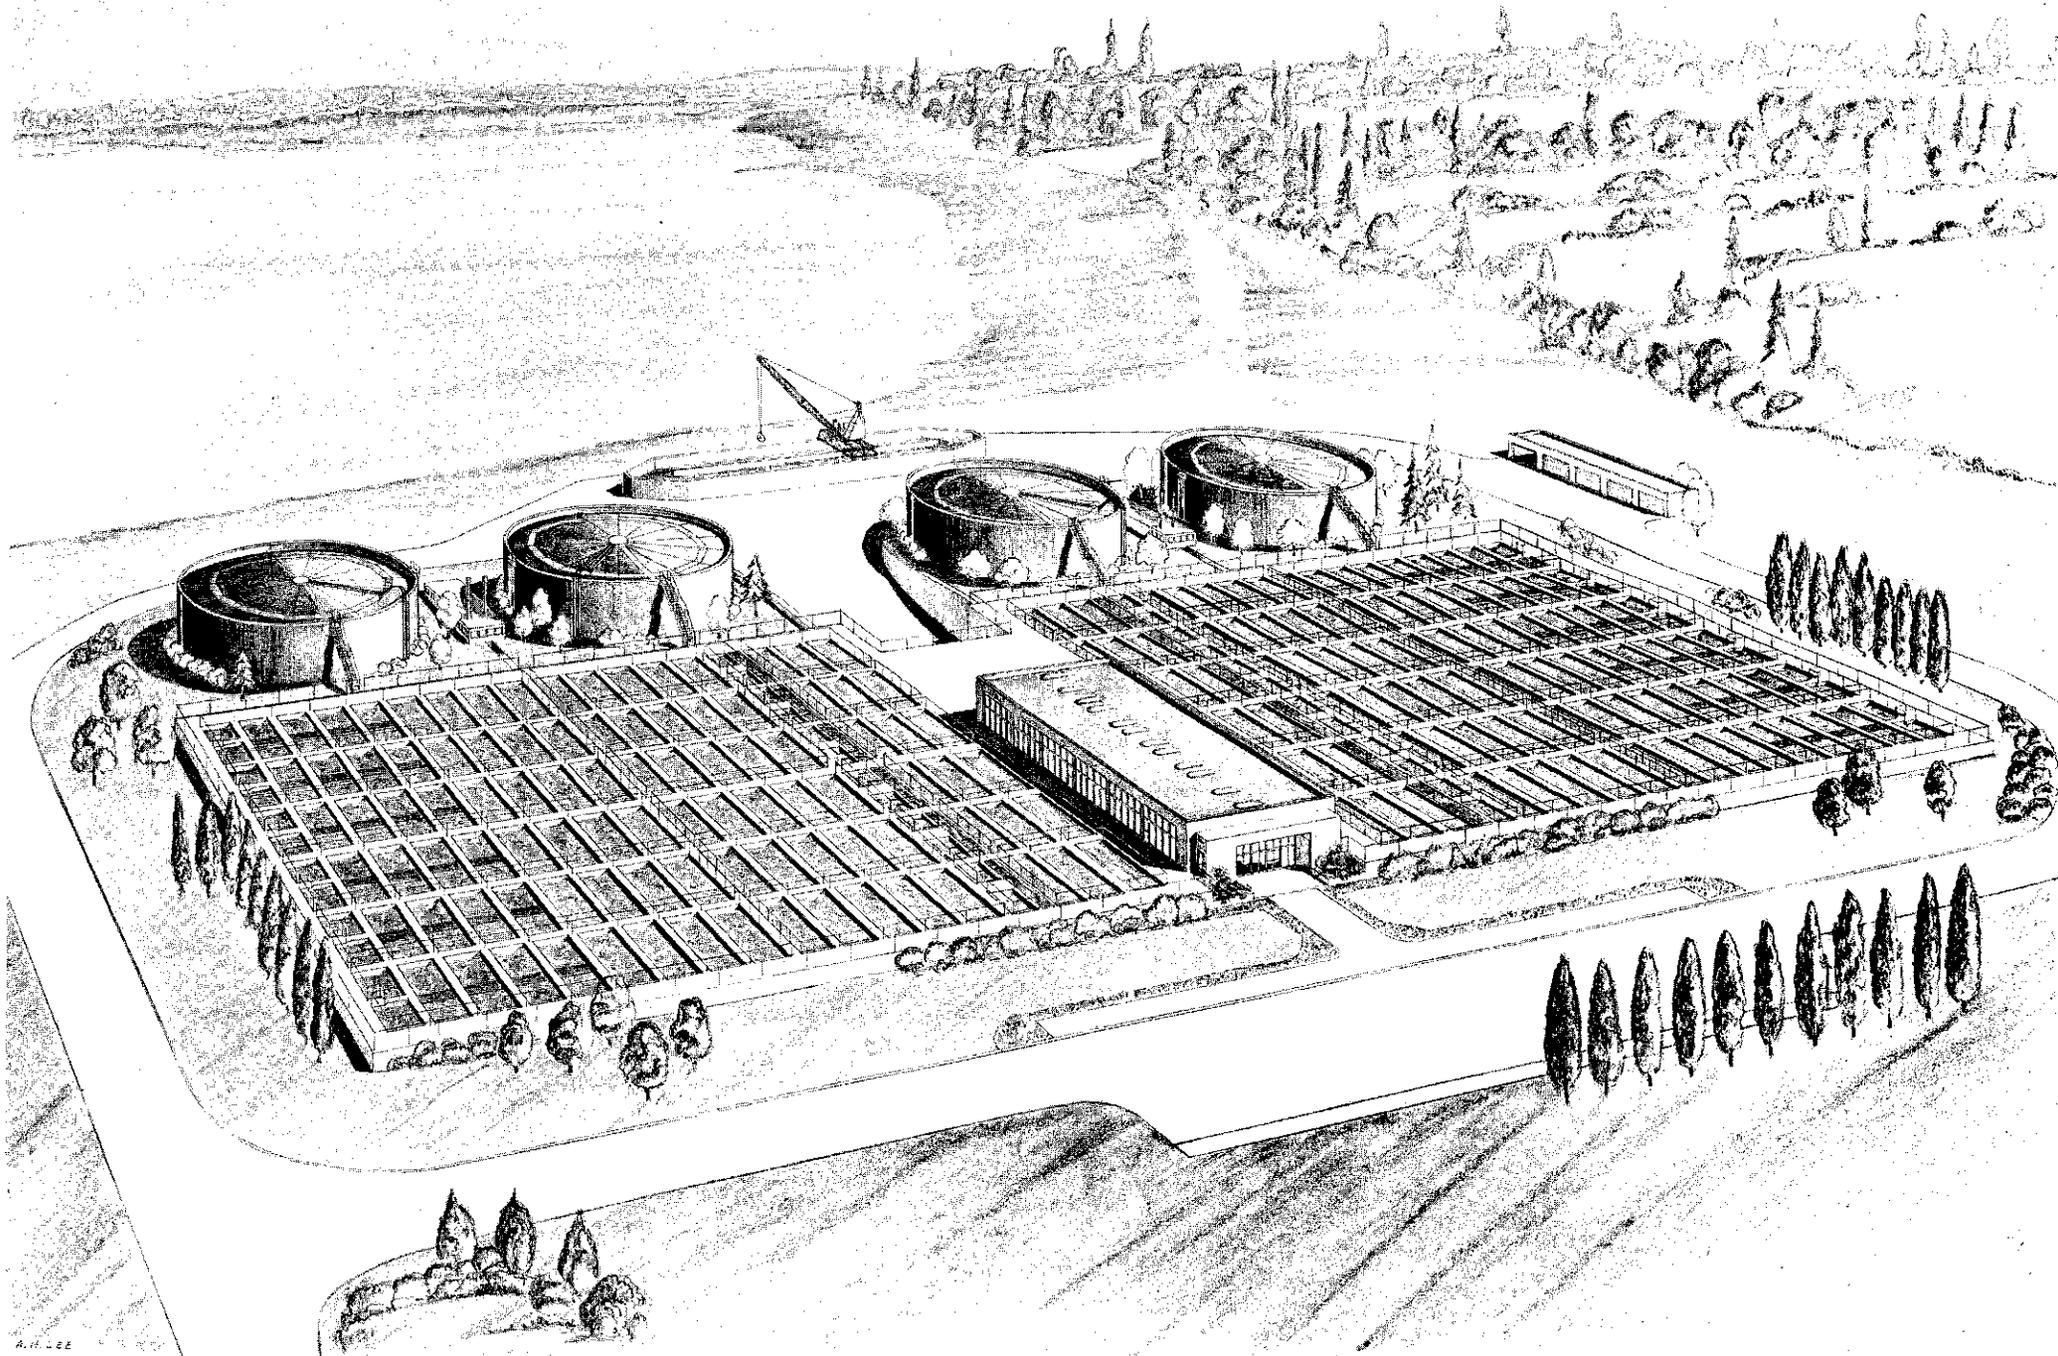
Perspective View of West Point Sewage Treatment Plant
